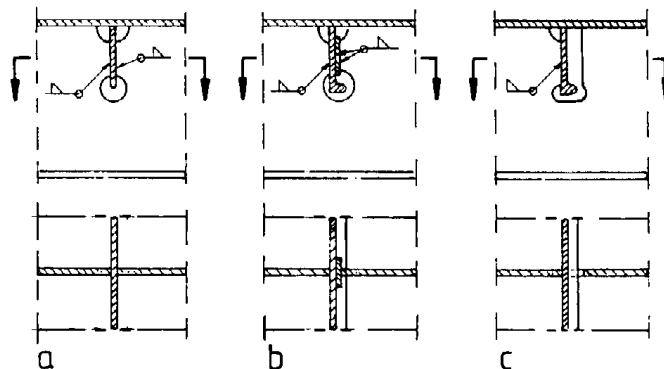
Development of the detailing of the connection between stringers and webs of cross girders, [Kunert, 1967].
